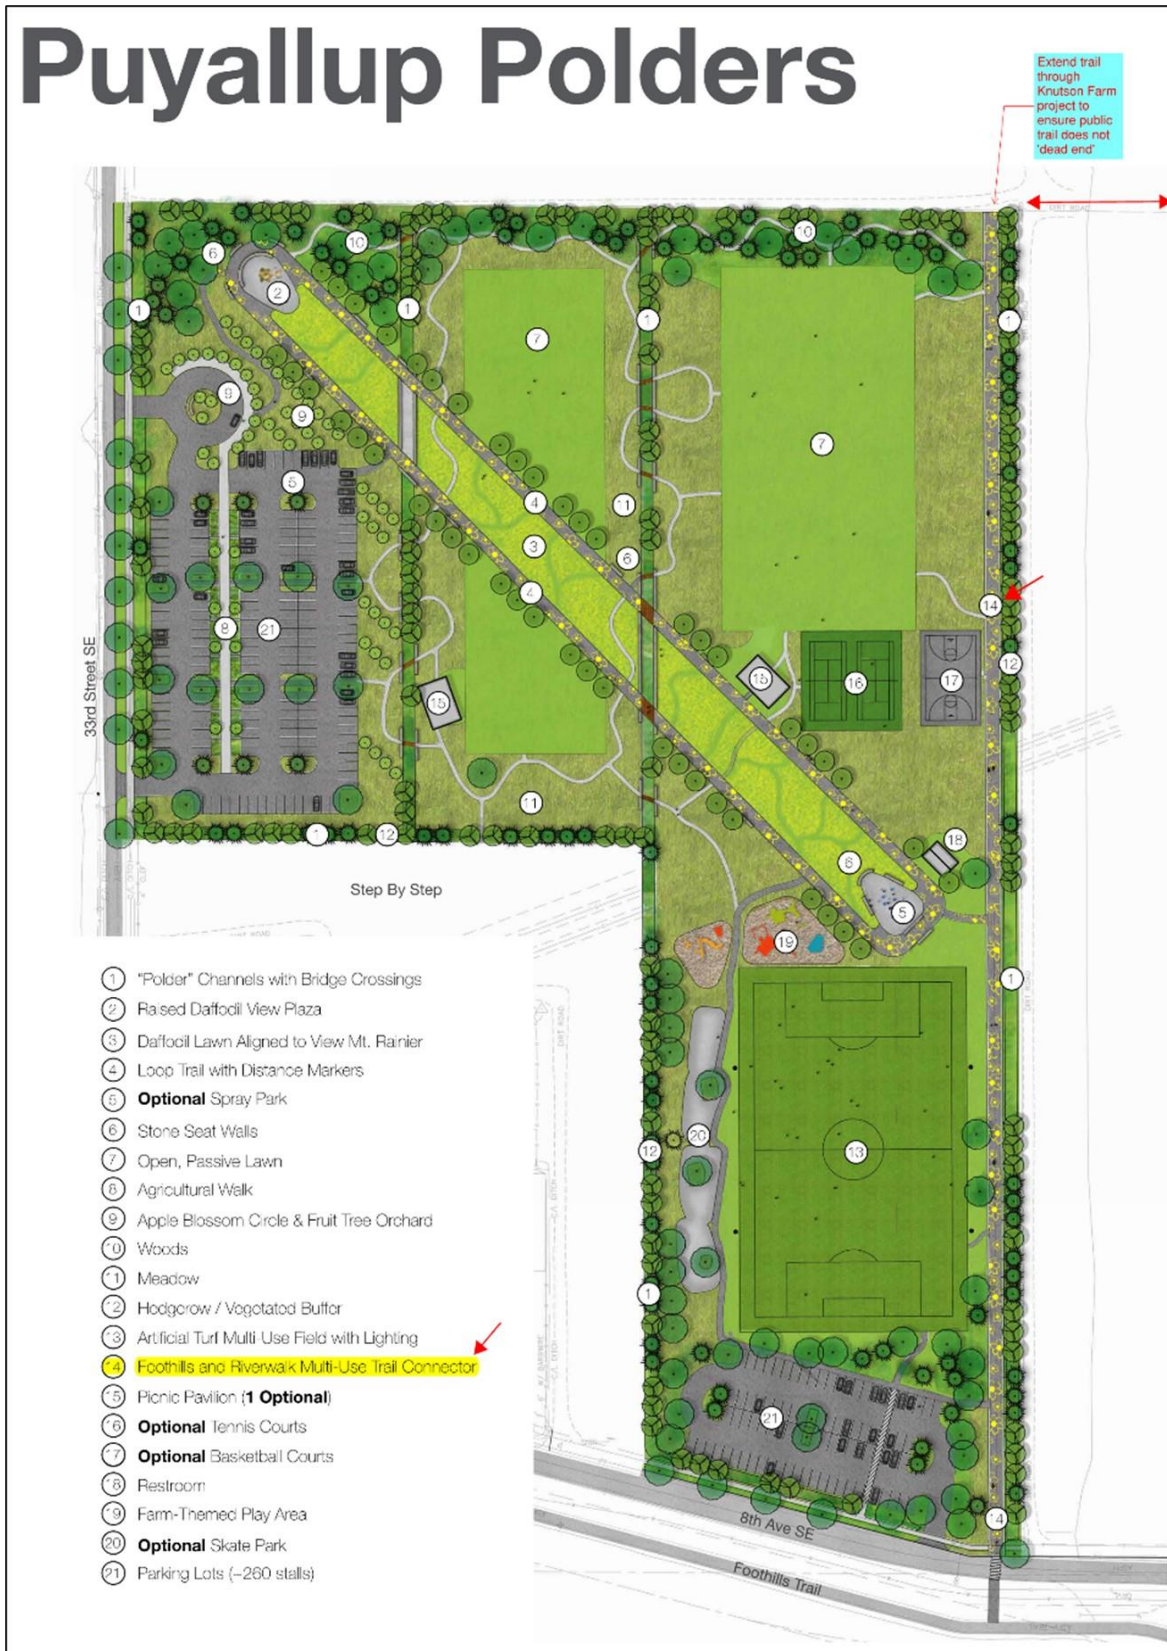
Excerpt from City's PROS Plan Showing Van Lierop Park Layout
